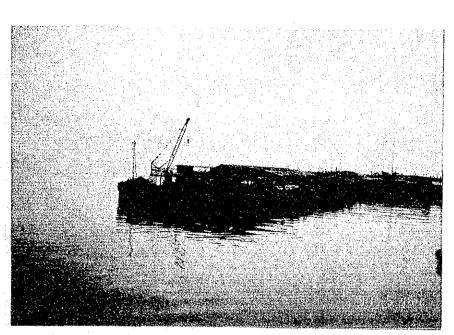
Ro/Ro Terminal Site of Port of Bacolod (Terminal Site) Source: JICA Study Team
